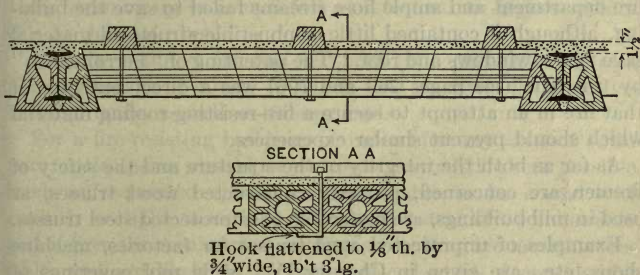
Arches between Mansard Rafters, U. S. Public Building, Los Angeles.
